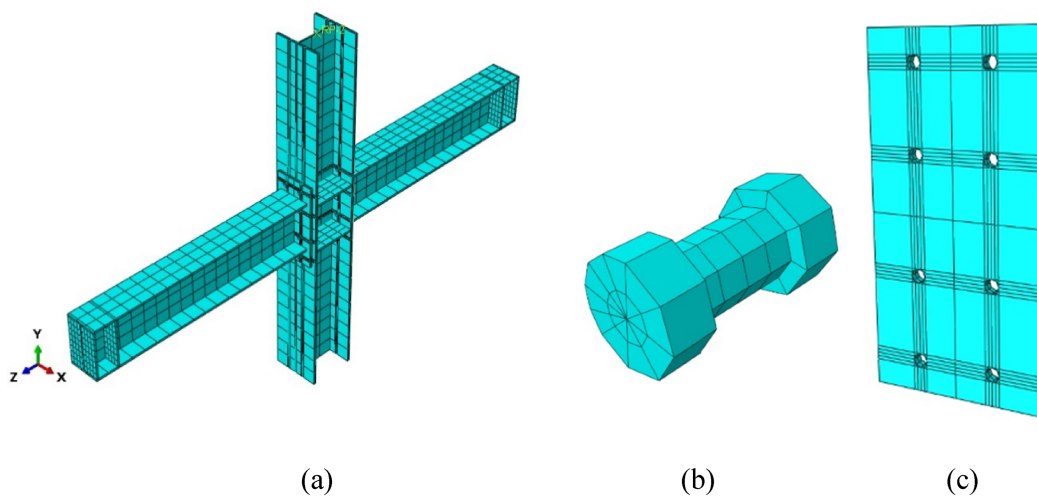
| Meshing (a) Whole assembly, (b) Bolt, and (c) Extended endplate.
